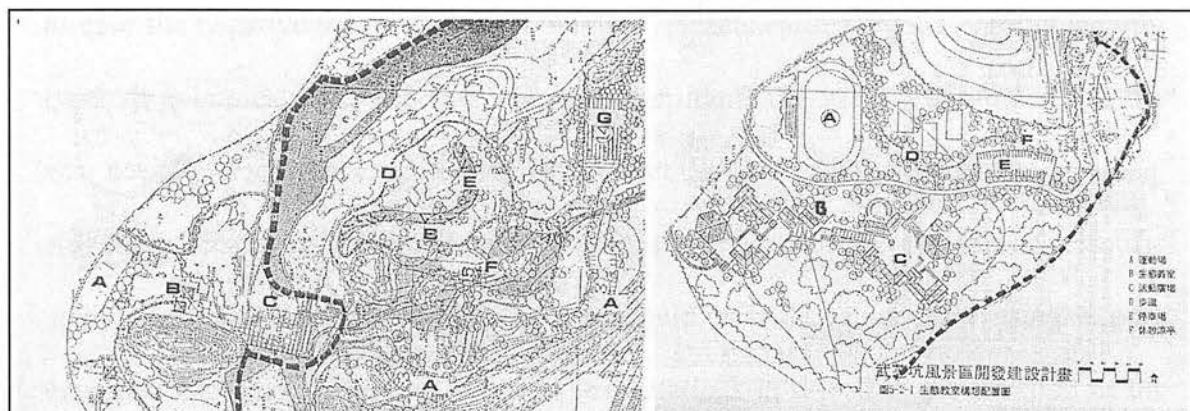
a) Detail plan for the riverside at Zone B (Left): This figure shows more detailed development of the Zone B area. A: Parking lots. B: Pavilions. C: Pedestrian walkway across the river. D: Other walkways around this riverside recreation area. F: The waterfront area. G: A shooting field. b) Detail plan for the ecology learning area at Zone D (Right): Zone D is designed with several sports fields and an ecology learning area, which is B. A is a stadium and C is a square for gather and some outdoor activities. D: Walkways. E: Parking lot. F: A pavilion.
